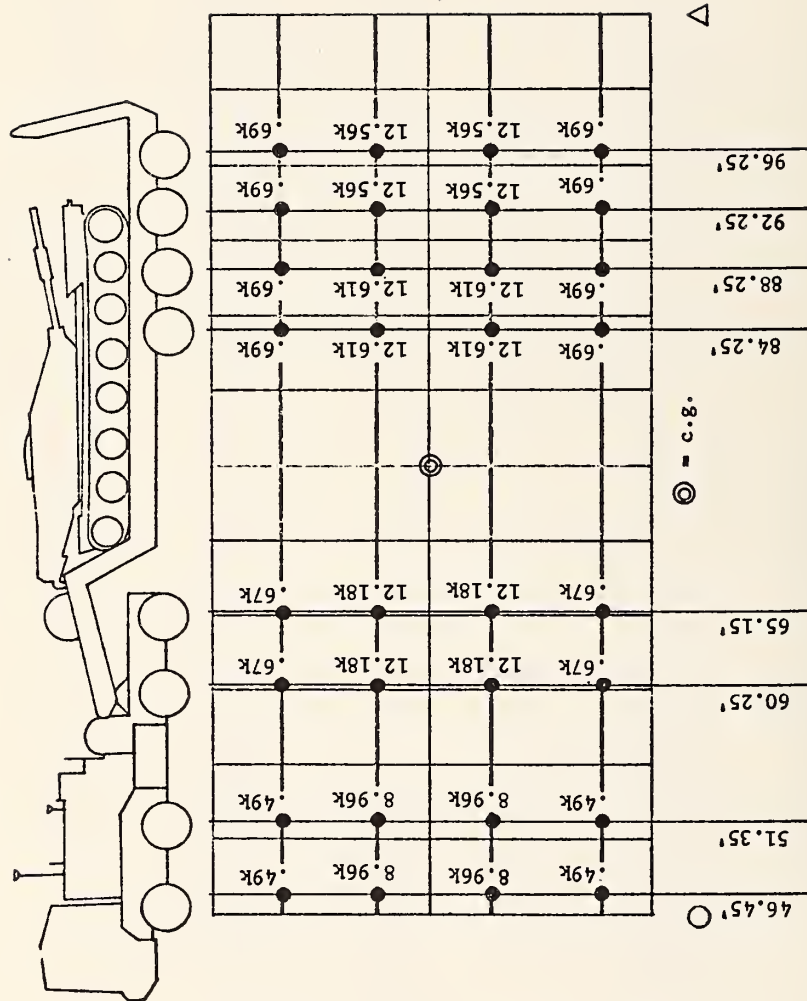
LOAD CONDITION 1, BRIDGE 4. CENTER OF GRAVITY OF HET-70 WHEEL LOADS AT THE CENTER OF THE FIRST INTERIOR 60' SPAN.
